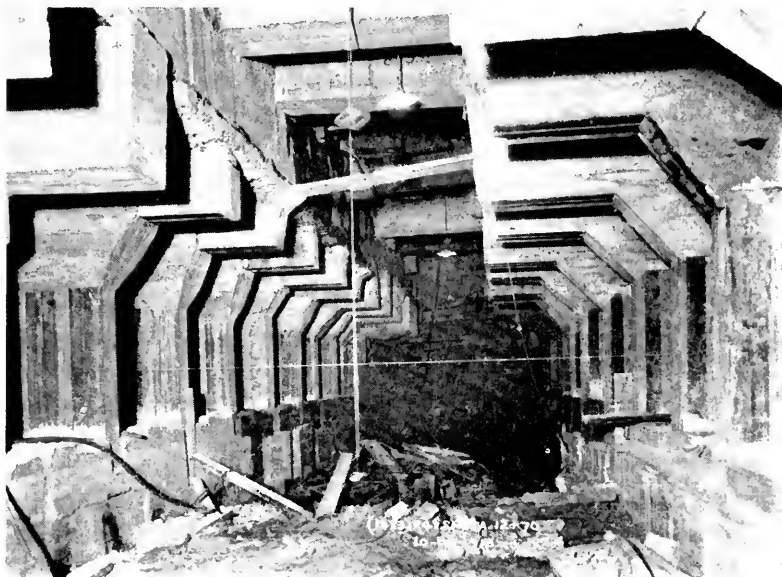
PARK PLACE — BEEKMAN STREET SUBWAY AT THE LOCATION OF THE UNITED STATES POST OFFICE BUILDING.
